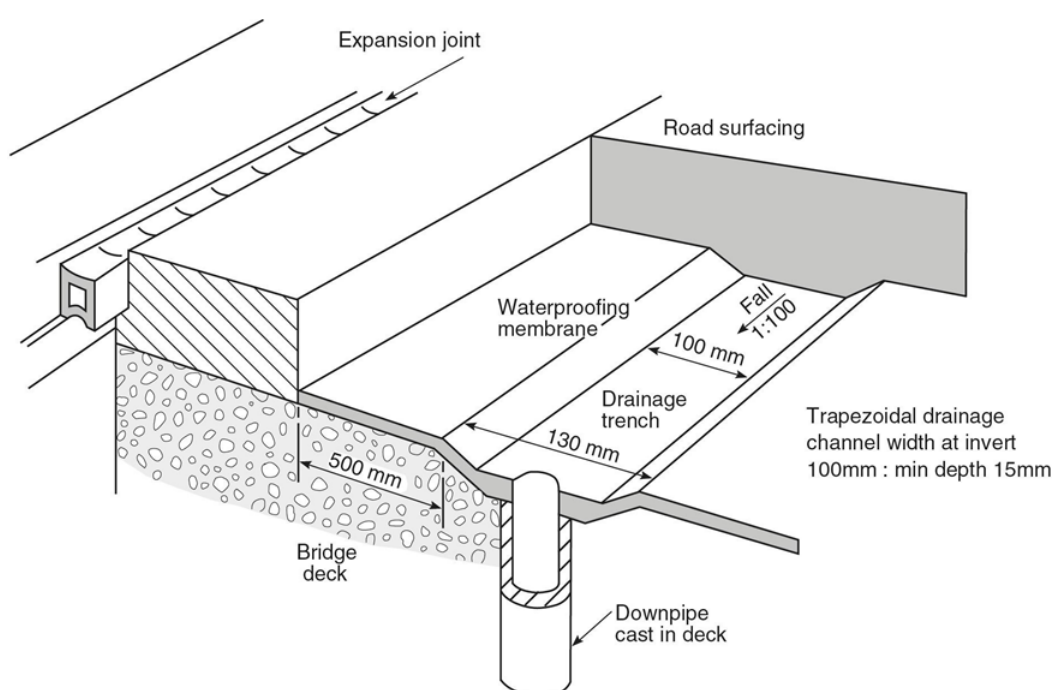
Typical detail for provision of sub-surface drainage adjacent to expansion joint using a transverse channel (Source Ref 1.I)
